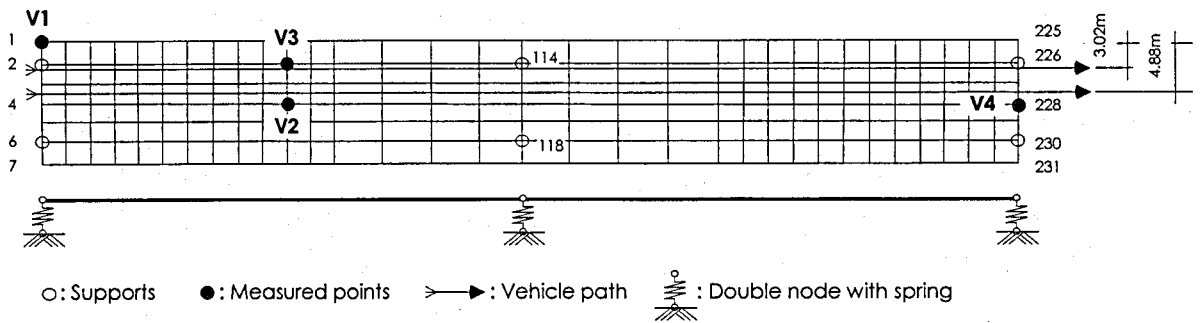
3-D plane FE model for steel two-girder bridge with PC deck
